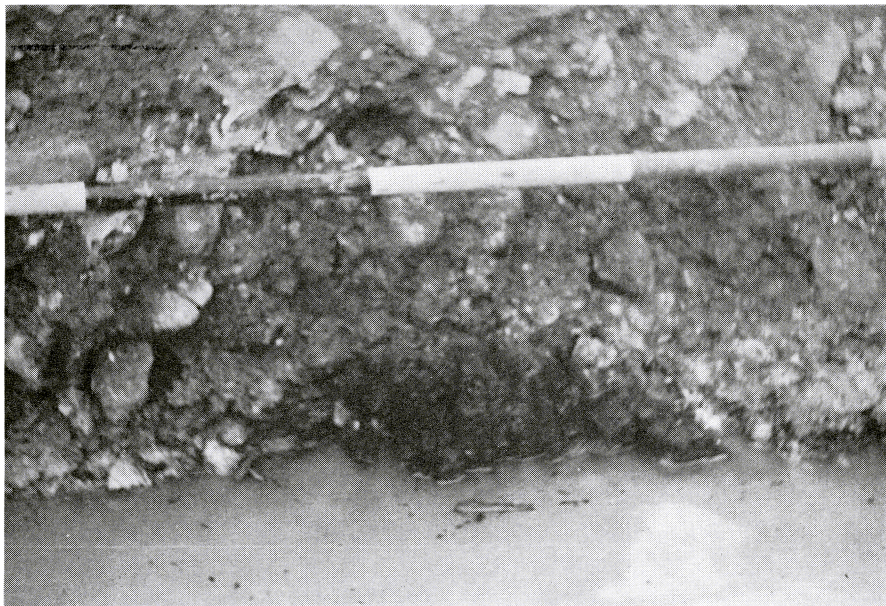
The Abbey Mill : footings of south pier of eastern line of arches, base of east face showing timber.
